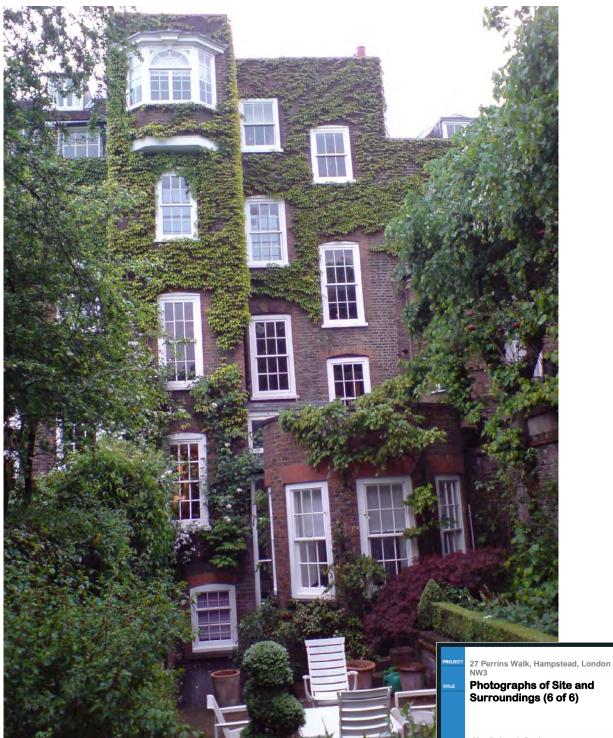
View of rear of No. 27 Church Row showing rounded brick extension (built 1990's) : No. 27 Church Row is Grade II* listed
